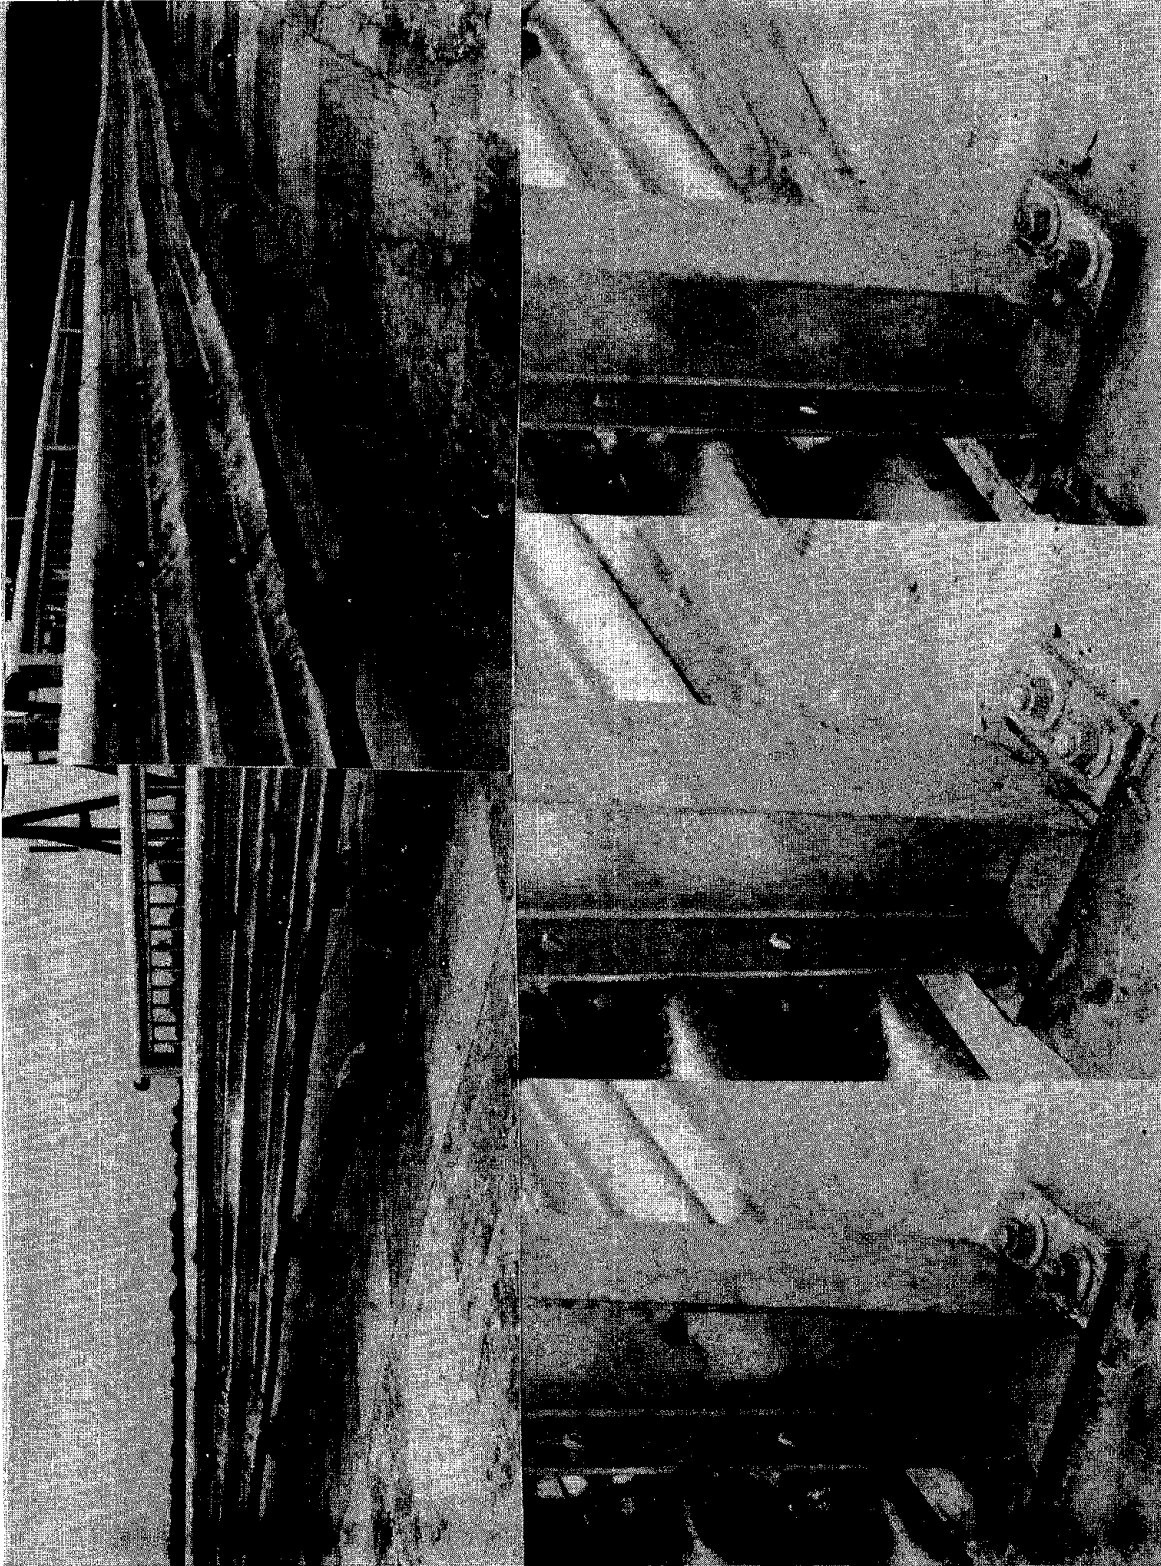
TEST RF-16 INSTALLATION DAMAGE
